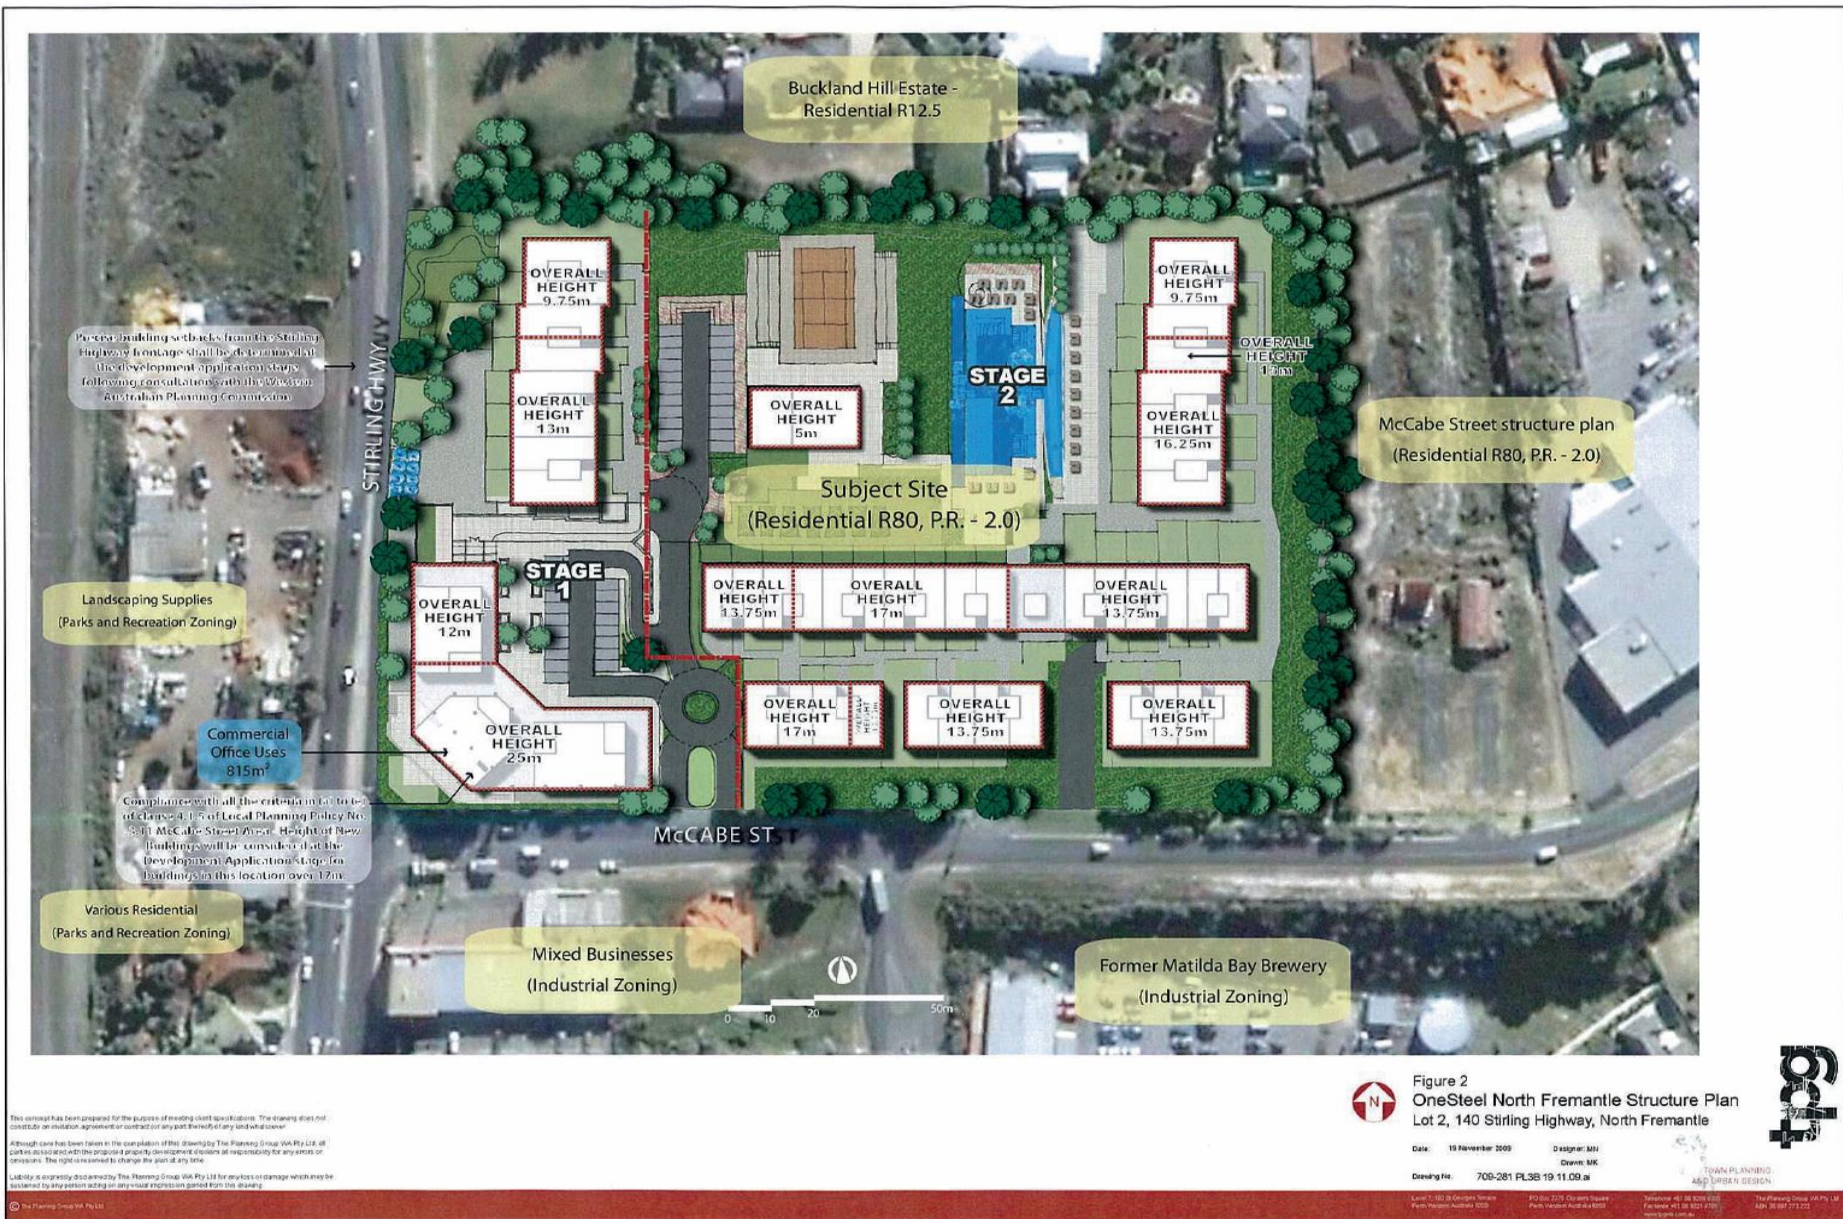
OneSteel North Fremantle Local Structure Plan 2009
